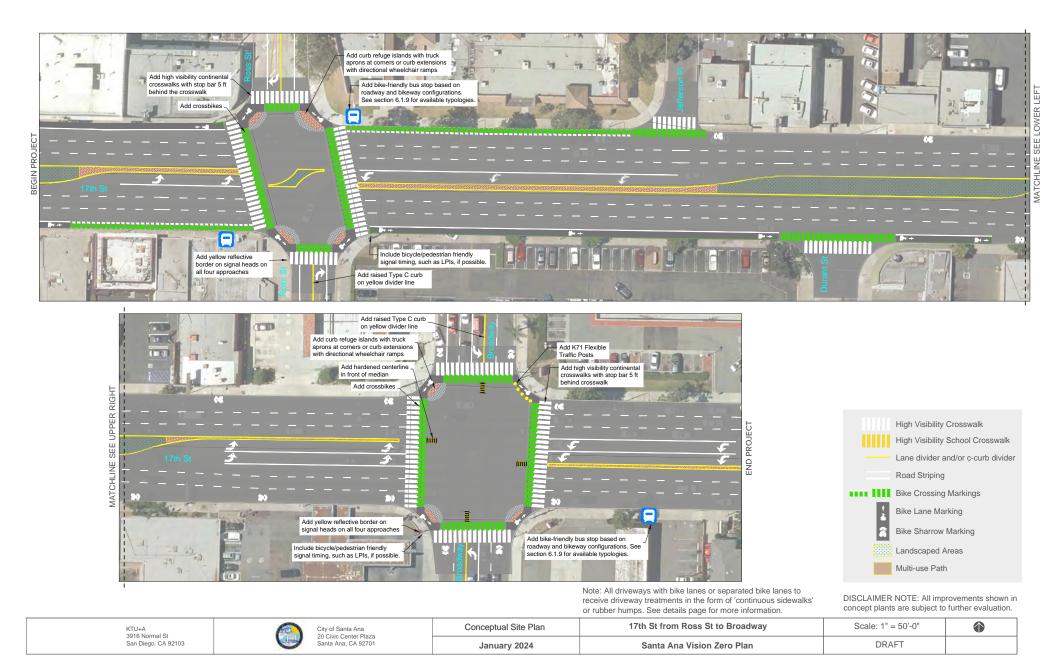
17th Street from Ross Street to Broadway Recommendations
